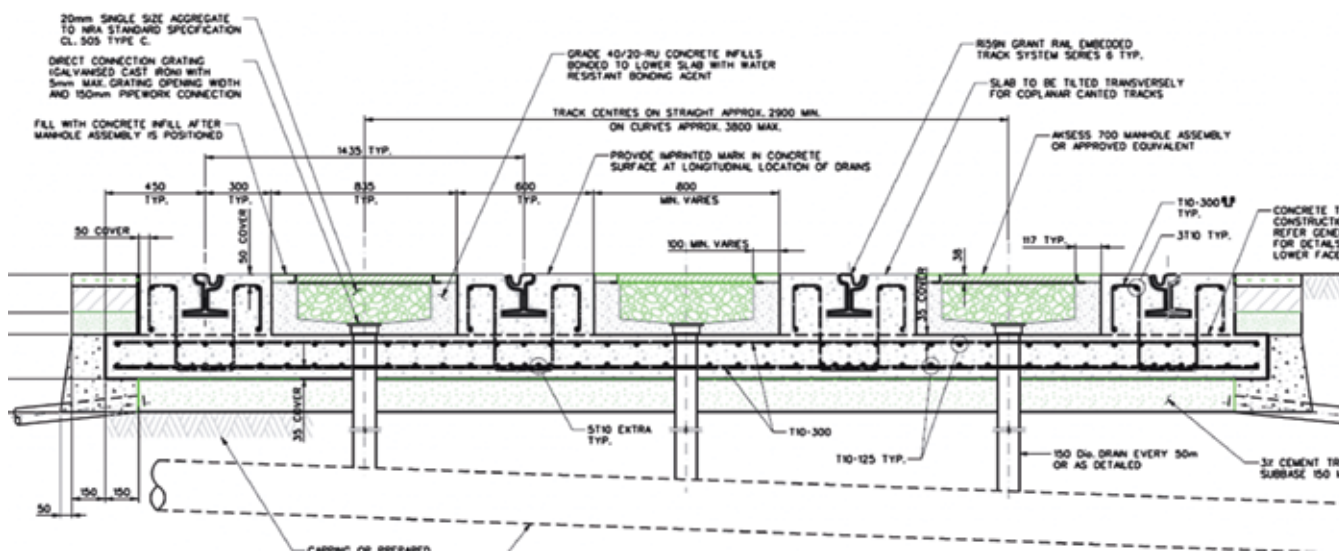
Example of a cross section of track type ‘Luas 2004’. Clearly visible are vertical drainage shafts connecting to a tilted horizontal drain pipe to divert access stormwater away from the subgrade layer. It is advised that vertical drains should be filled with gravel and topped with geotextile material. (Image source: Corsi 2017)
